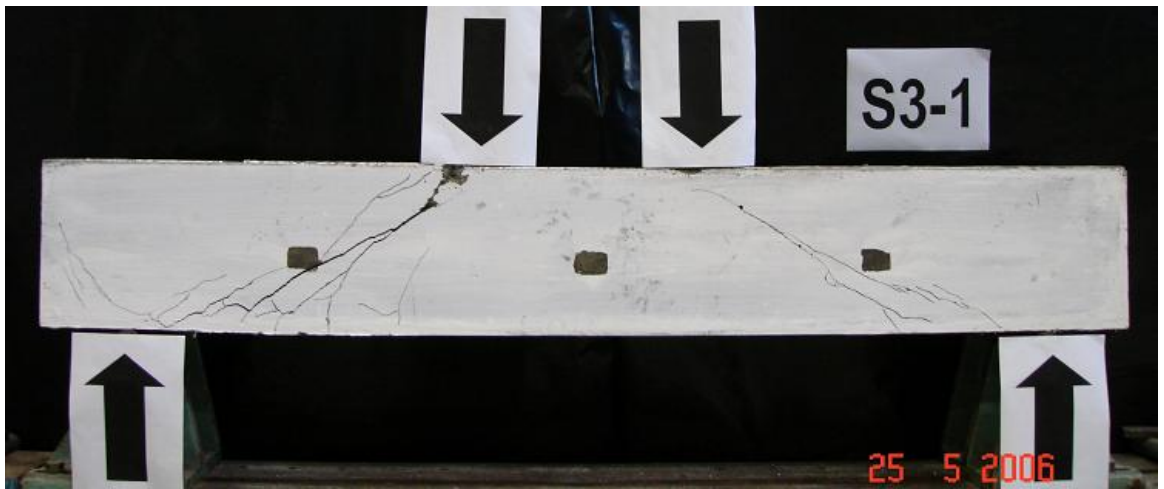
Overall Crack Pattern for Beam 3-1 (Front Face)
